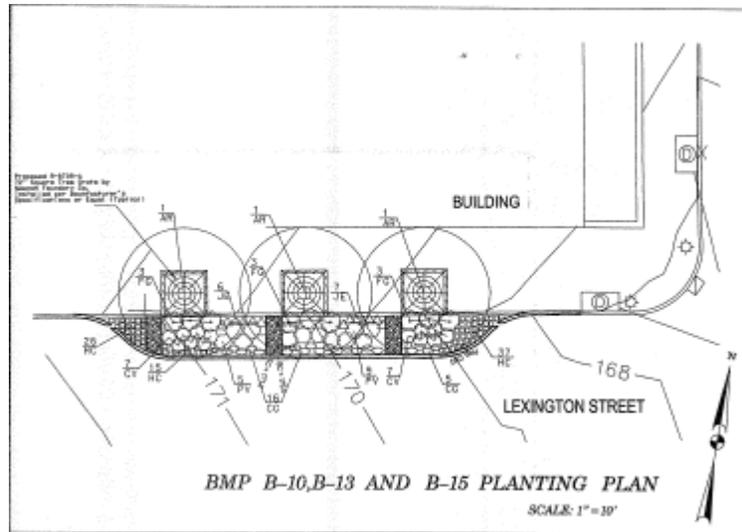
Engineer’s detail of a Stormwater Curb Extension used at sites B-10, B-13, & B-15. (City of Baltimore DPW, 2007) A full set of details for all the BMPs can be found at http://www.d2edesign.com/ws263_test2/ws26301.html
